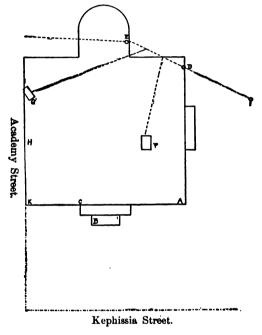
PLAN OF MR. MERLIN'S HOUSE.
